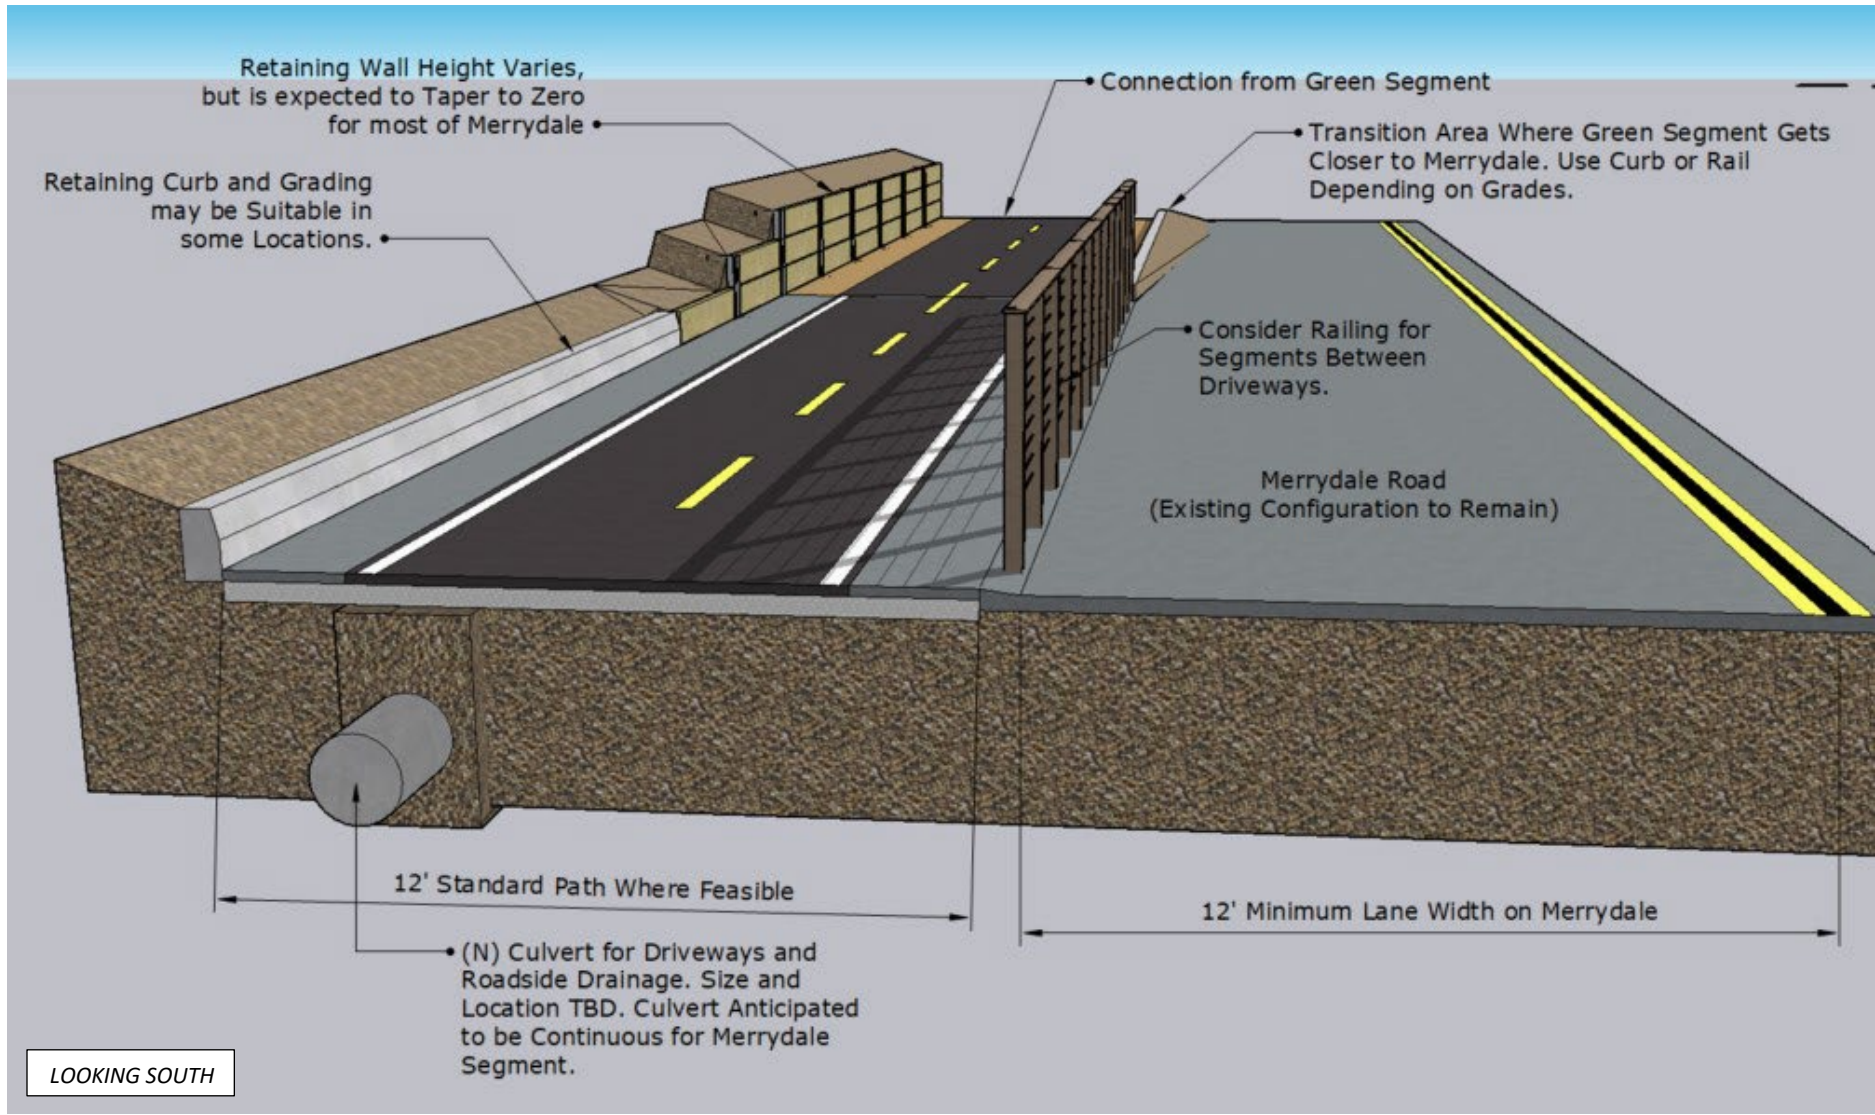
Green Segment to Cyan Segment Connection along Merrydale Road
